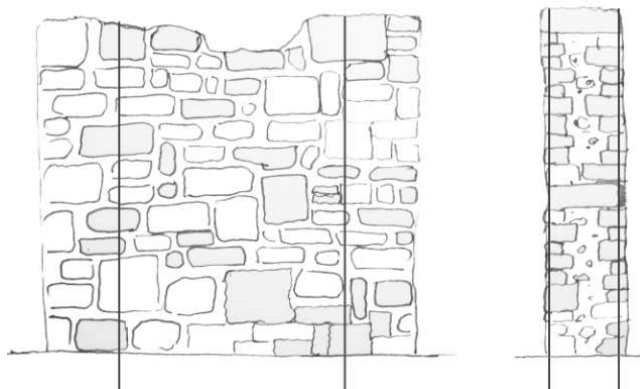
Internal anchors applied to irregular stone masonry wall supplemented by a load distributing tie beam
